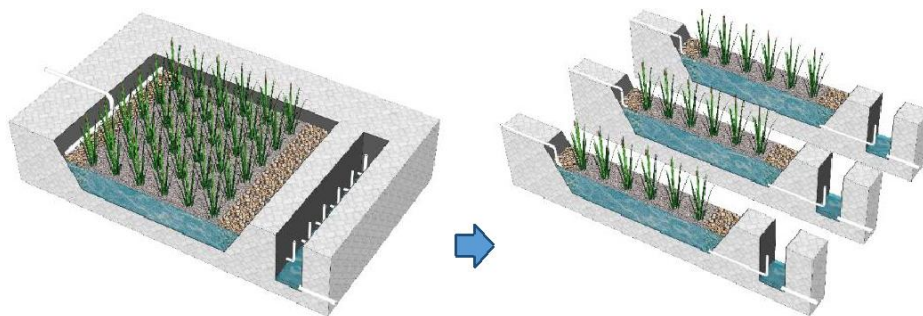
Dividing units of horizontal subsurface flow constructed wetlands(HSF CWs)
